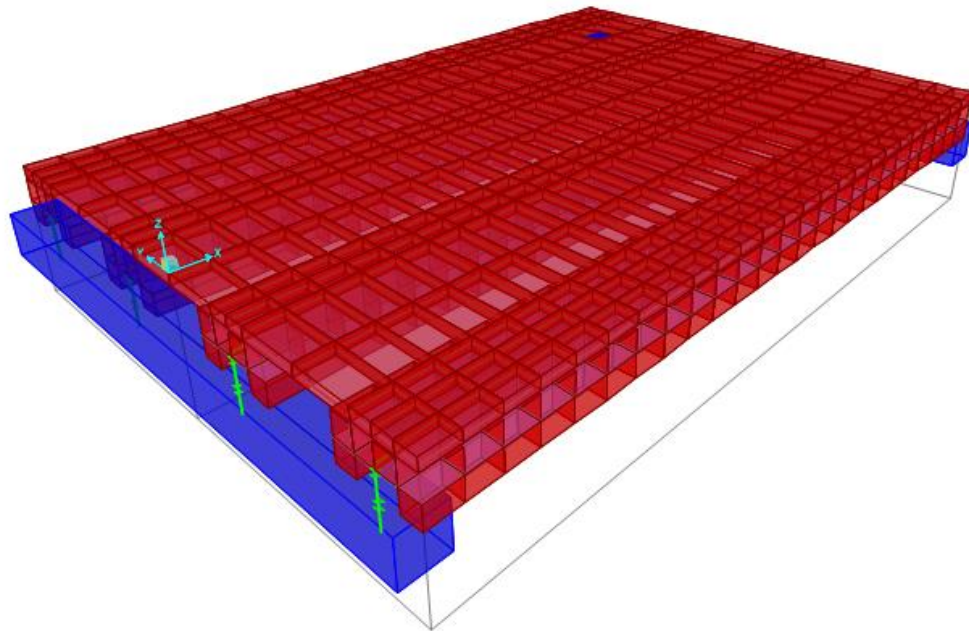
Riverside Bridge Shell Element Model (Hueste et al. 2014)
